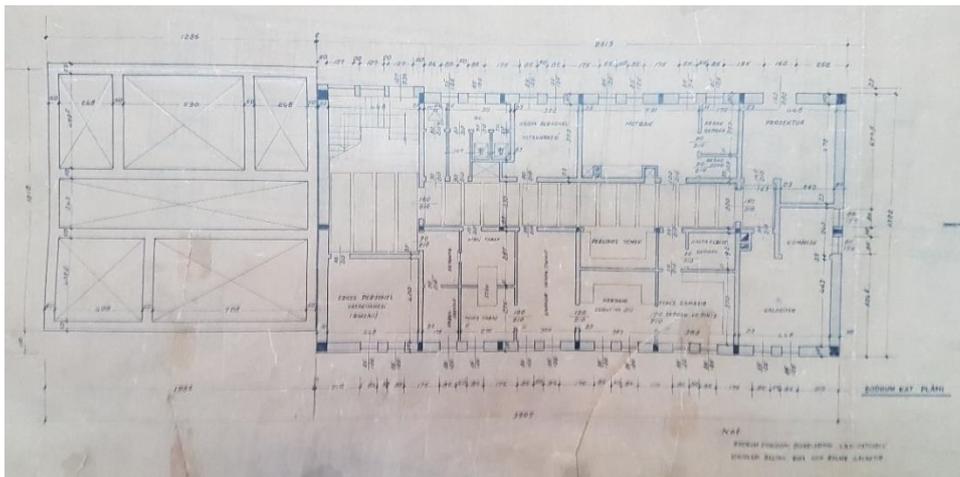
The basement floor plan of the hospital (Source: TTK Archive, 2020)
